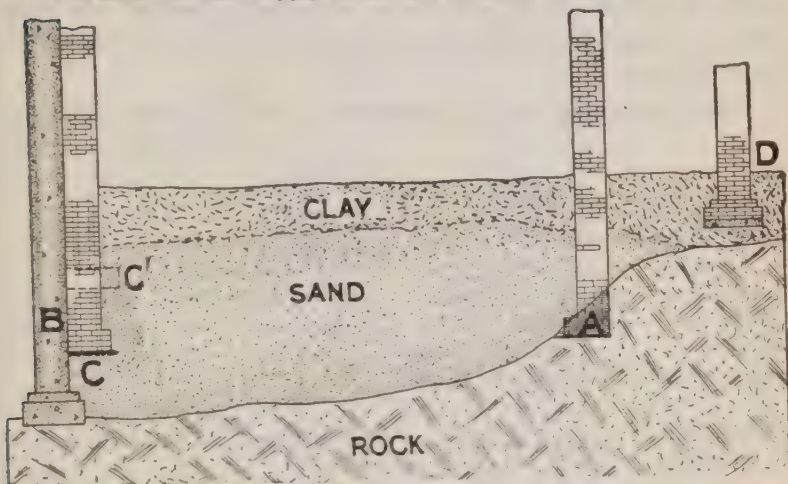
,770.—Section of foundation, showing at A, a rock condition below a sand stratum sloping at a point where a foundation base must be placed and how it is leveled for it to avert any possible danger of its creating a pressure against the resisting sand by which it might yield upward where not under compression other than its own weight, thus allowing base to slip and cause disaster. If it is to be placed against another wall as at B, it will be safe to lay the base at any depth below frost in the sand as at CC'. The sand cannot yield or be displaced unless voids are created. At D, the rock bed is quite level and the clay rests upon it, here the base of foundation may start, even without going to rock bottom and be perfectly safe.
